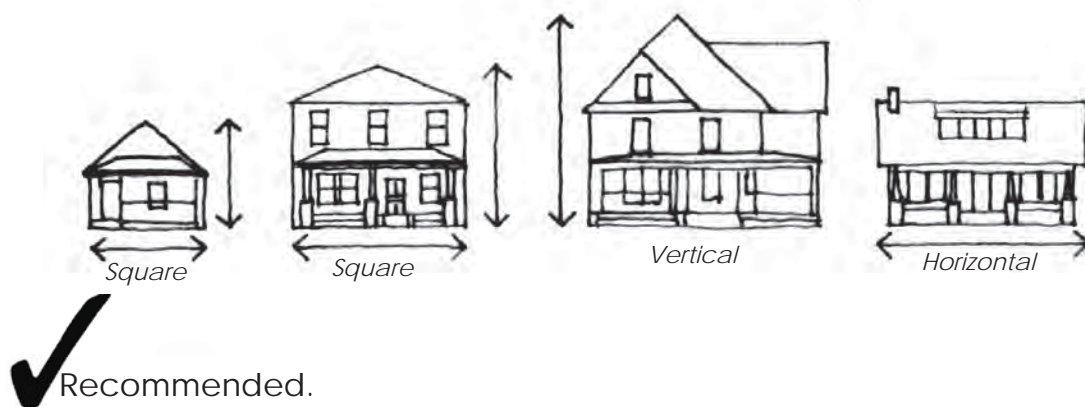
Design new buildings so that they reflect local historic building forms and shapes, whether gabled, cross-gabled, or hipped. Avoid forms such as elongated ranch styles and A-frames. *Source: JMA collection.
